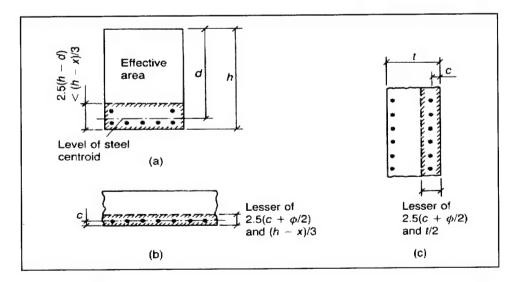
Effective tension area: (a) beam, (b) slab, (c) member in tension (note: where ϕ is the average diameter of steel bars, x is the depth of the compression zone prior to cracking)
